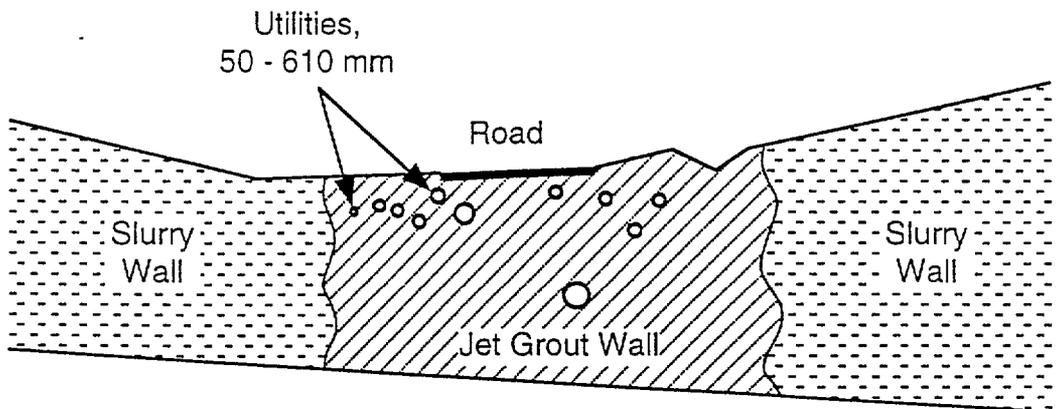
Construction of Cutoff Wall at Utility Crossing by Jet Grouting (after Gazaway and Jasperse, 1992).
